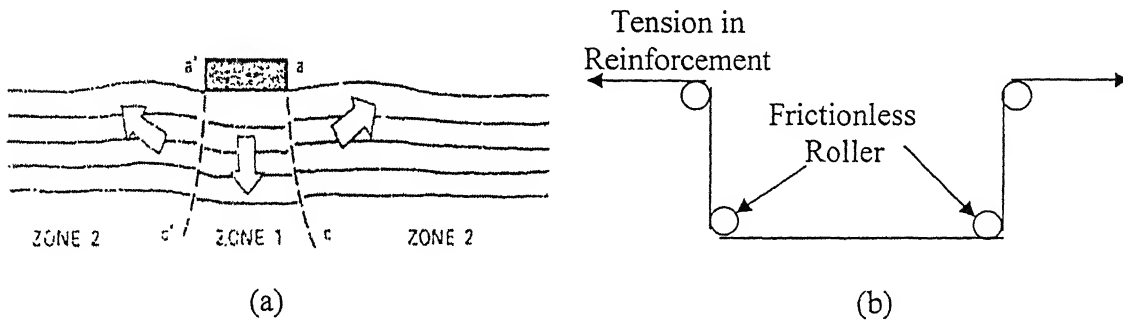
Assumed Failure Mechanism under a foundation supported by reinforced earth
